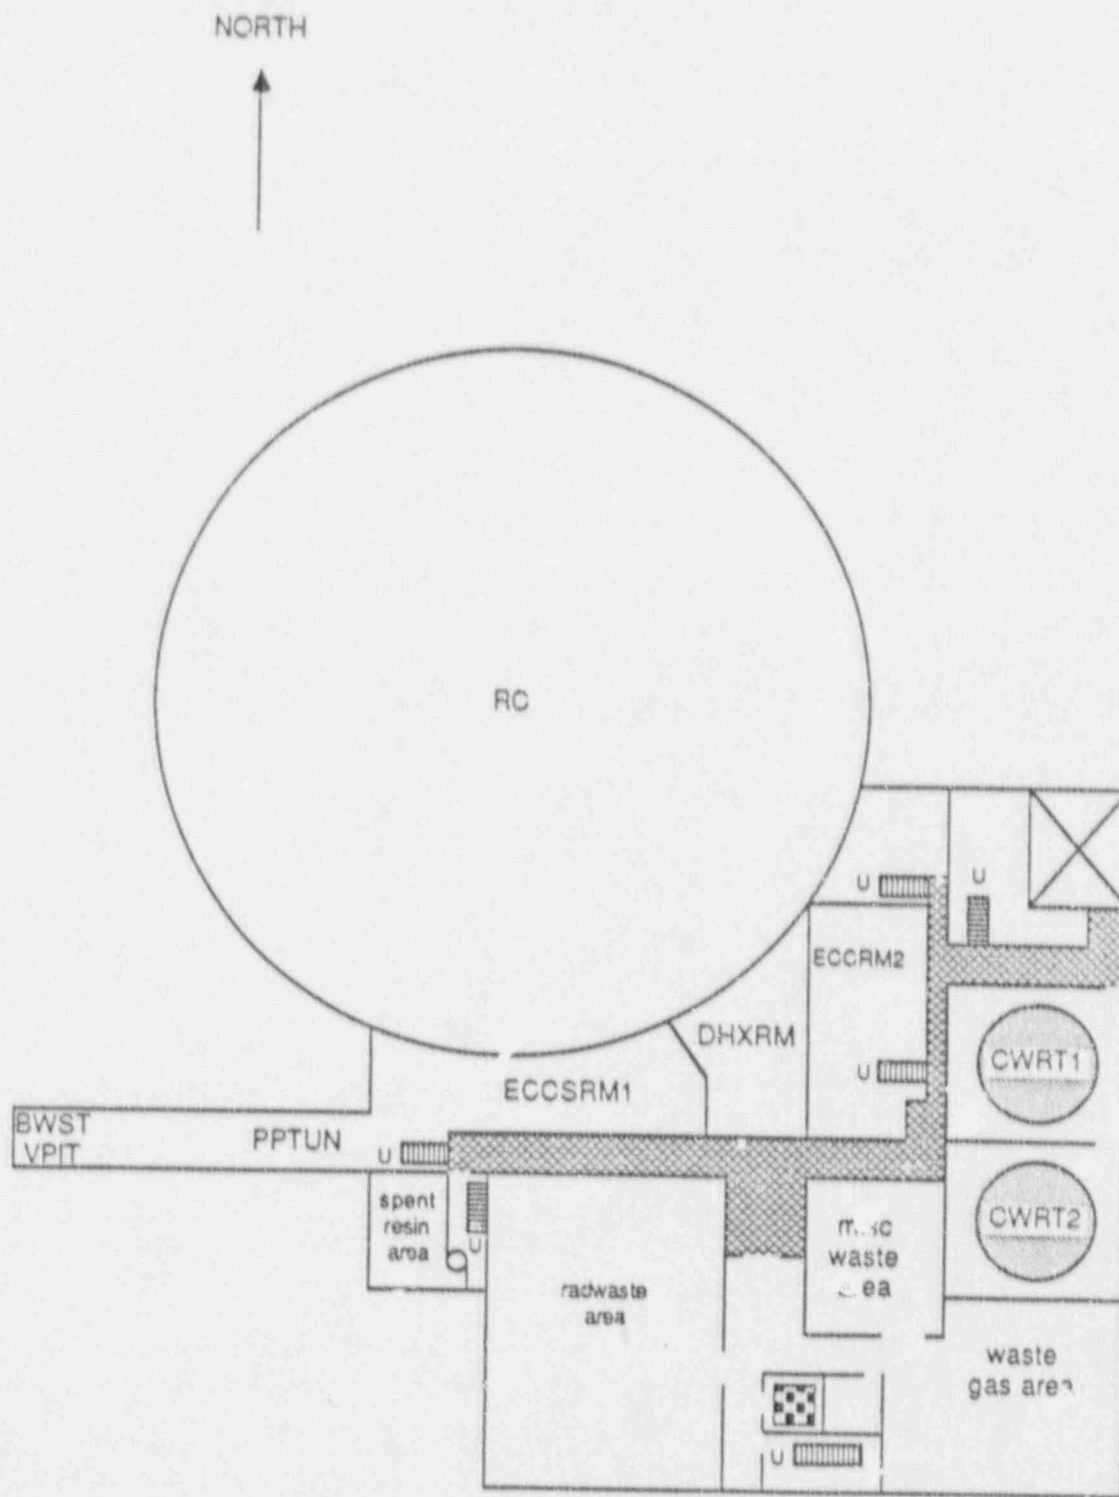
Davis-Besse Containment and Auxiliary Buildings, Elevation 545 feet
